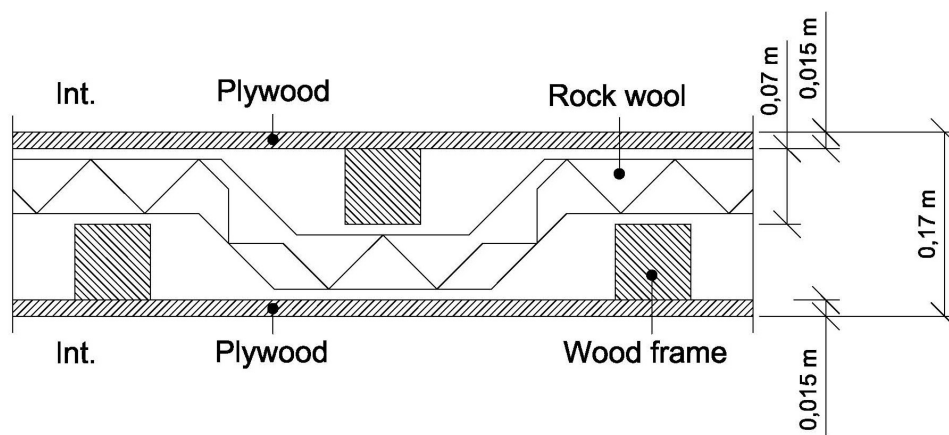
Horizontal cross section of wall W3: wood frame.
